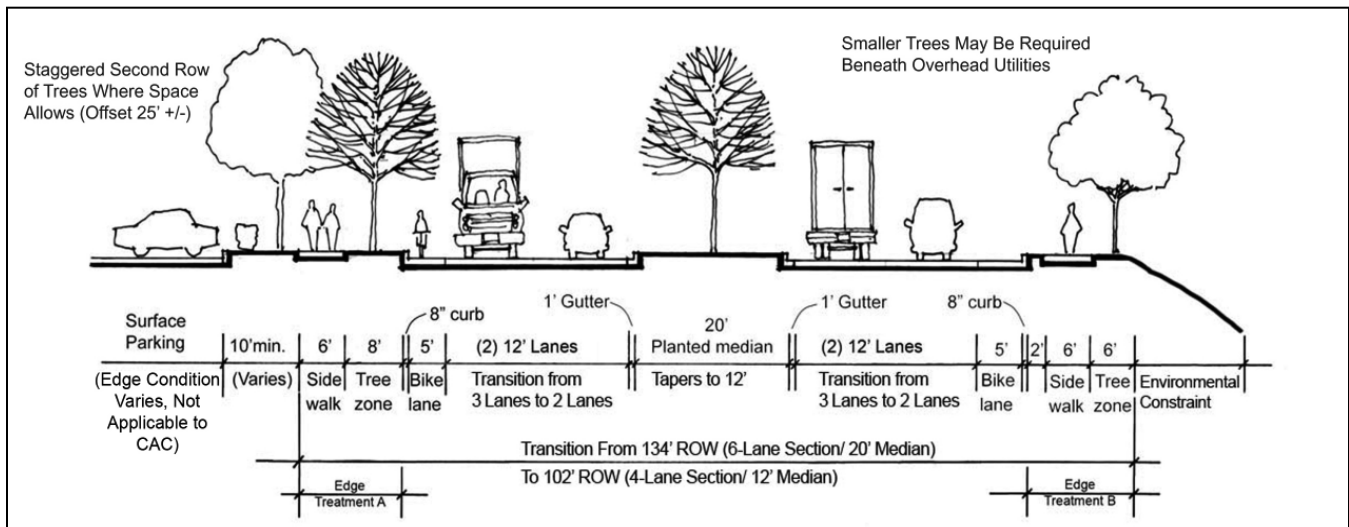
From Montgomery Road north to Bonnie View Lane, the road will transition from a 134-foot section with six lanes and a 20-foot median to a 102-foot section with four lanes and a 12-foot median.
